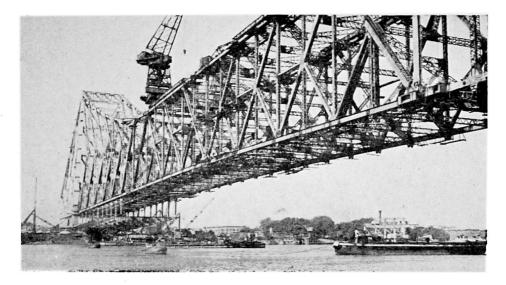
New Howrah Bridge, Calcutta. Junction of suspended span after erection as two cantilevers
